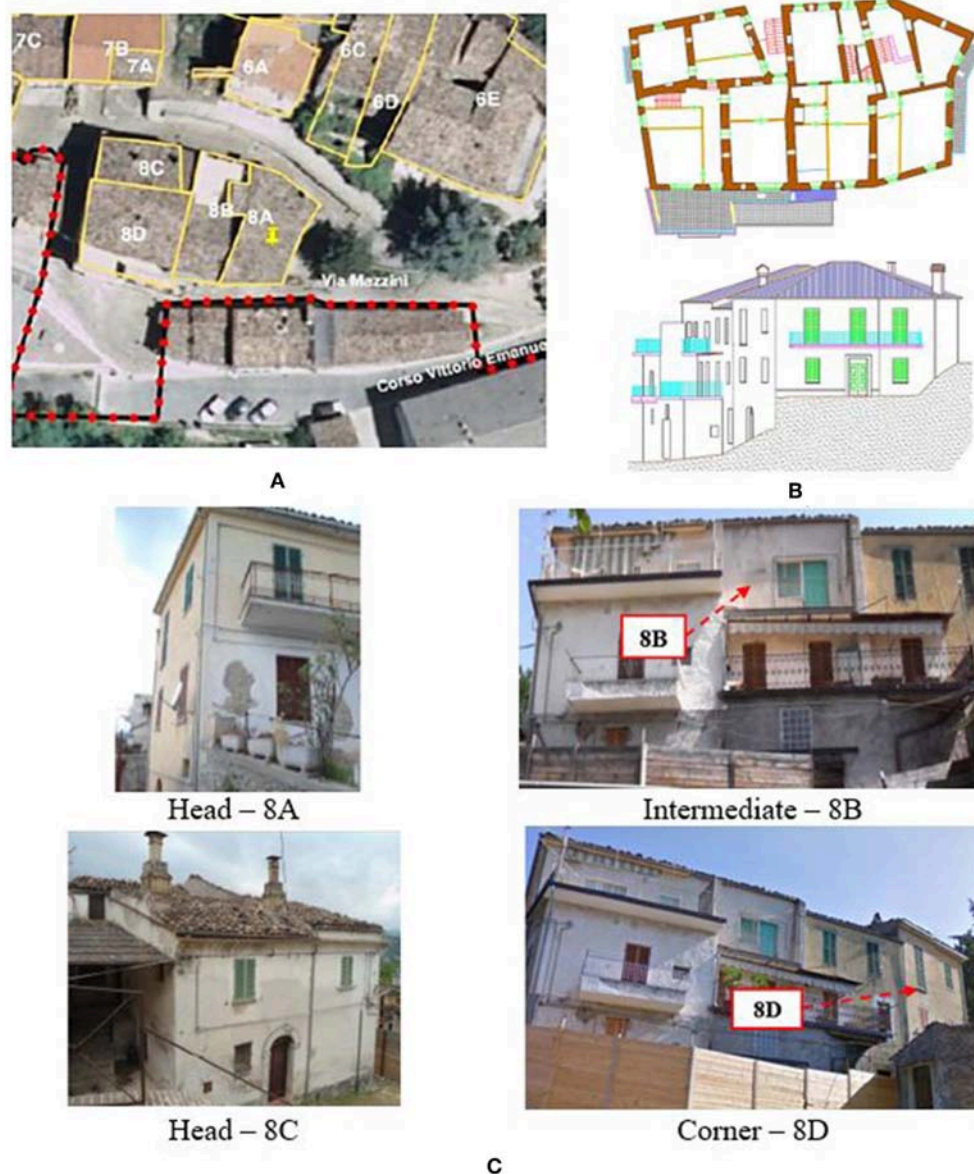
| Structural configuration of the case study masonry buildings aggregate: (A) plan layout of the intermediate floor, (B) South-West view, and (C) positions of SUs in the compound of buildings.
